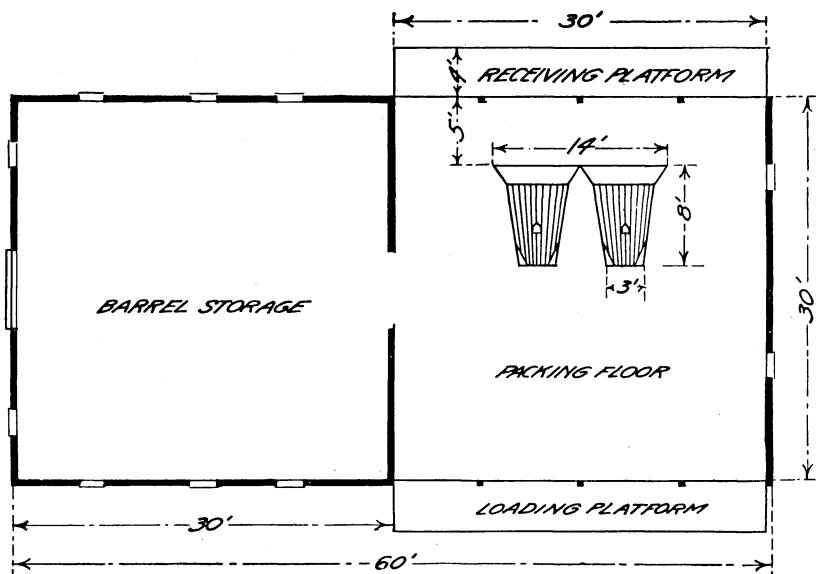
Plan 1: Floor plan of a packing house designed for handwork operations.
